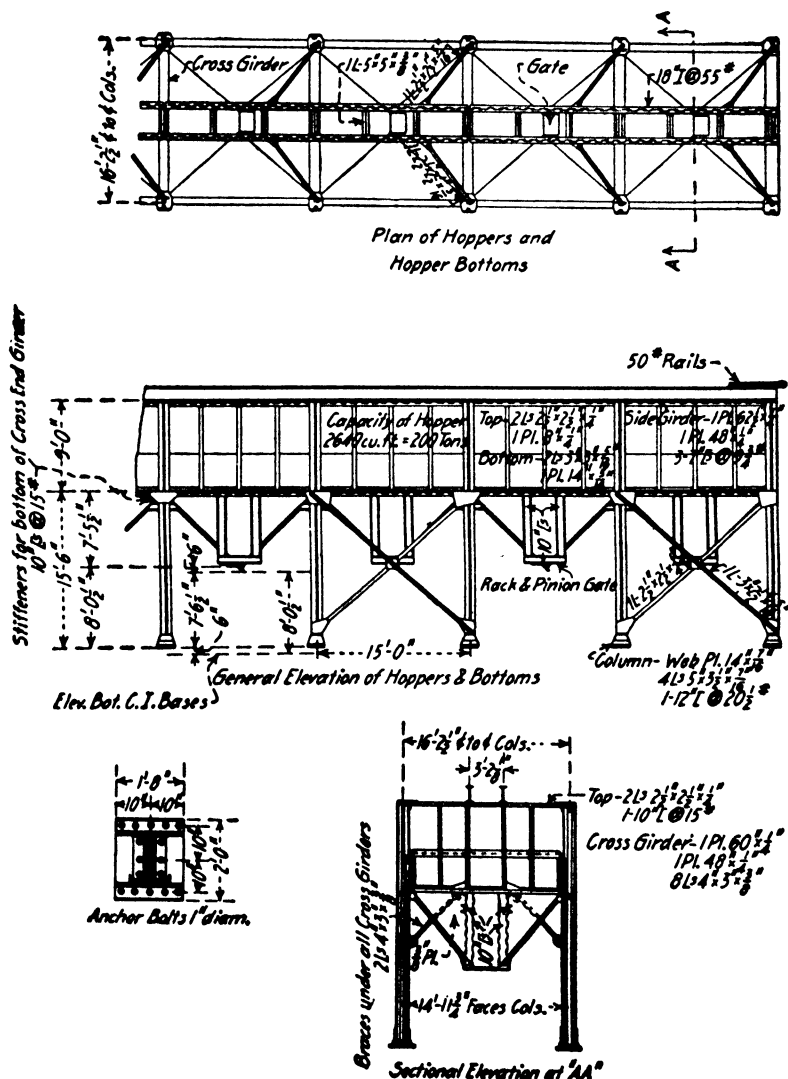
HOPPER BIN CANANEA CONSOLIDATED COPPER CO., CANANEA, MEXICO.
